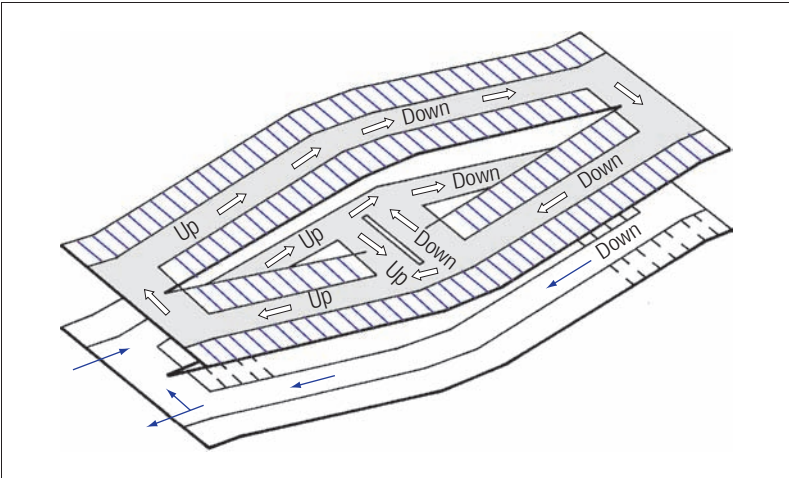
Ramped floor car park with separate entry and departure parking ramps
